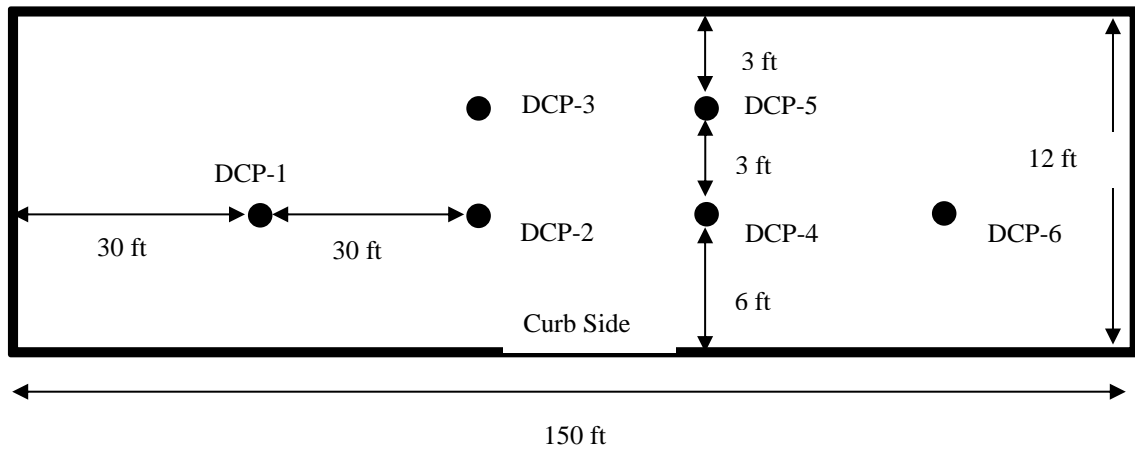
six DCP tests conducted in the field plan of each section (Five sections were created with same test plan)
